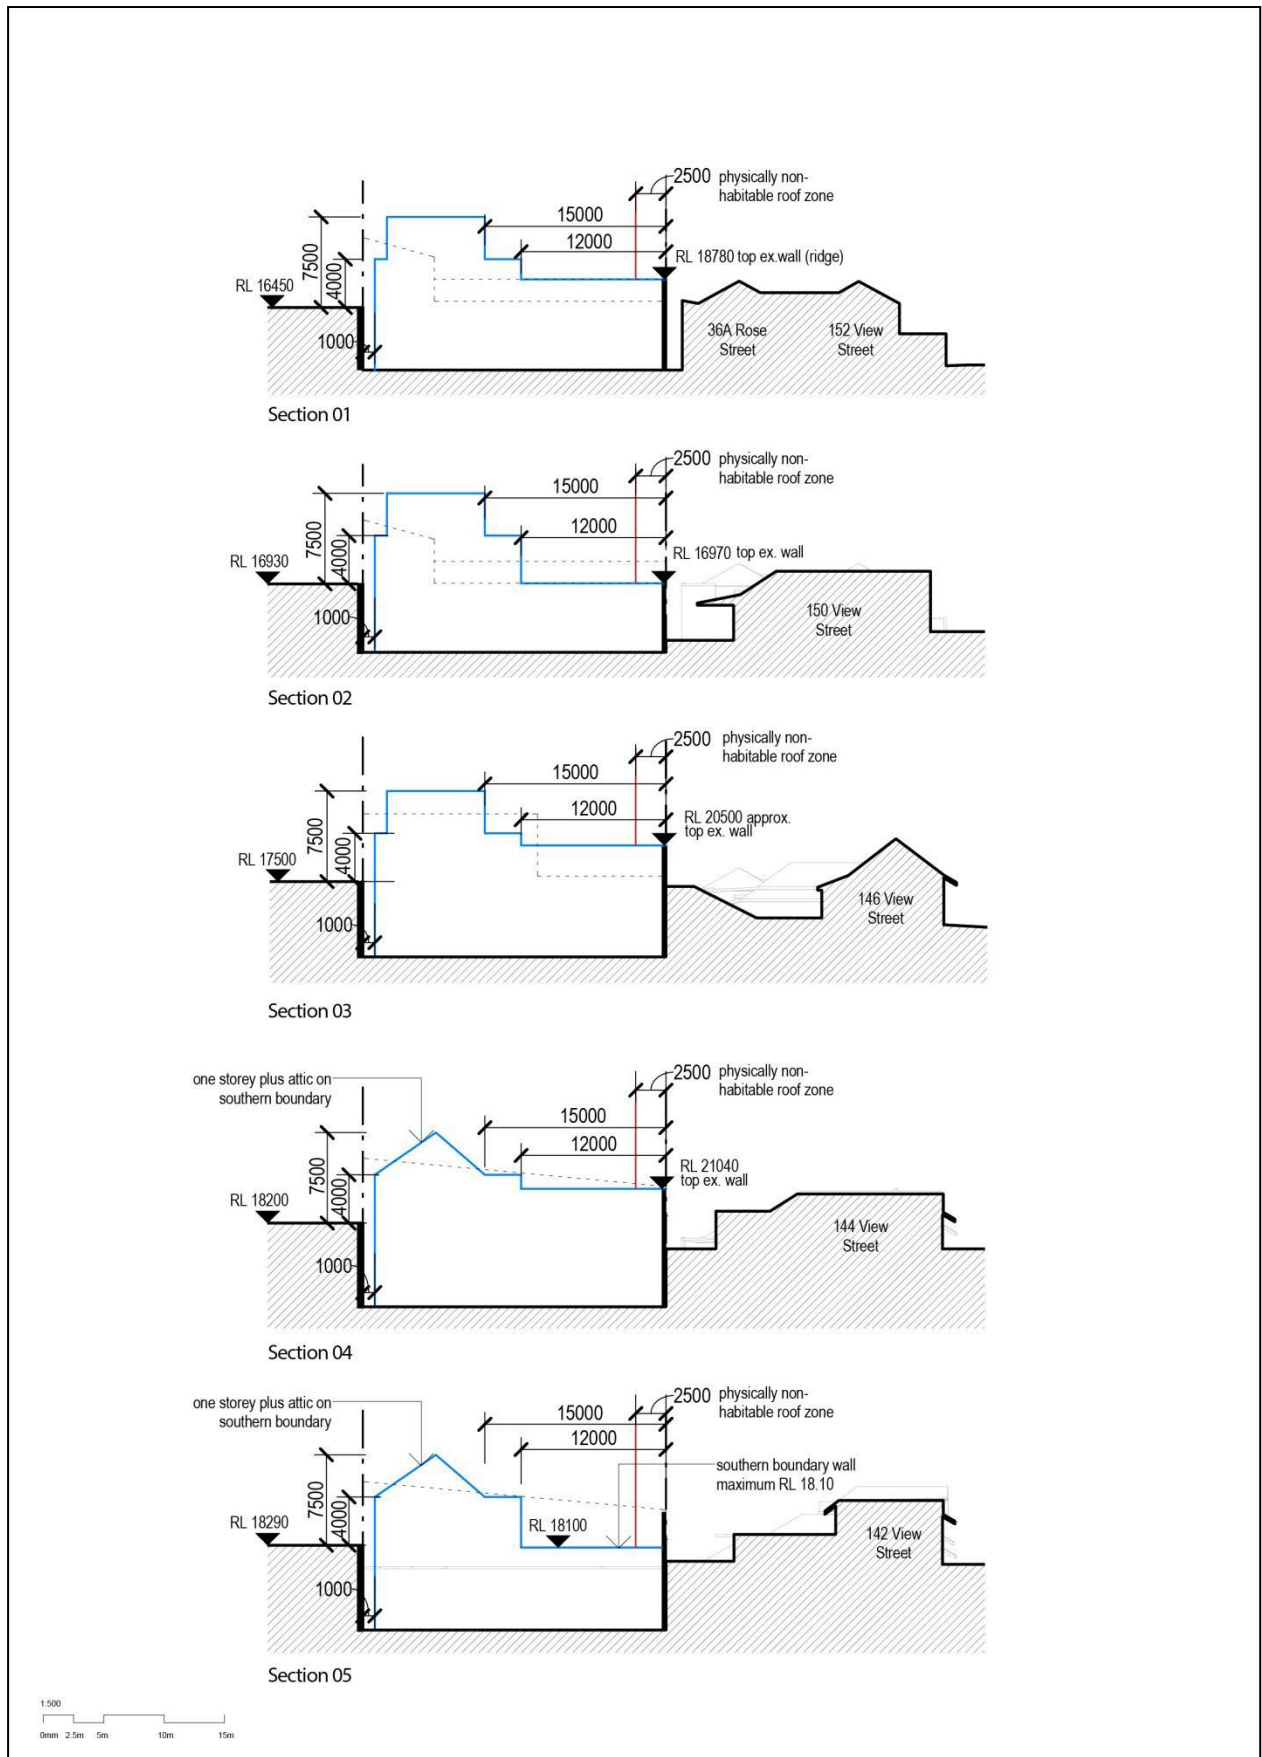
Building Heights and Massing Envelopes – Section 01, Section 02, Section 03, Section 04 and Section 05
